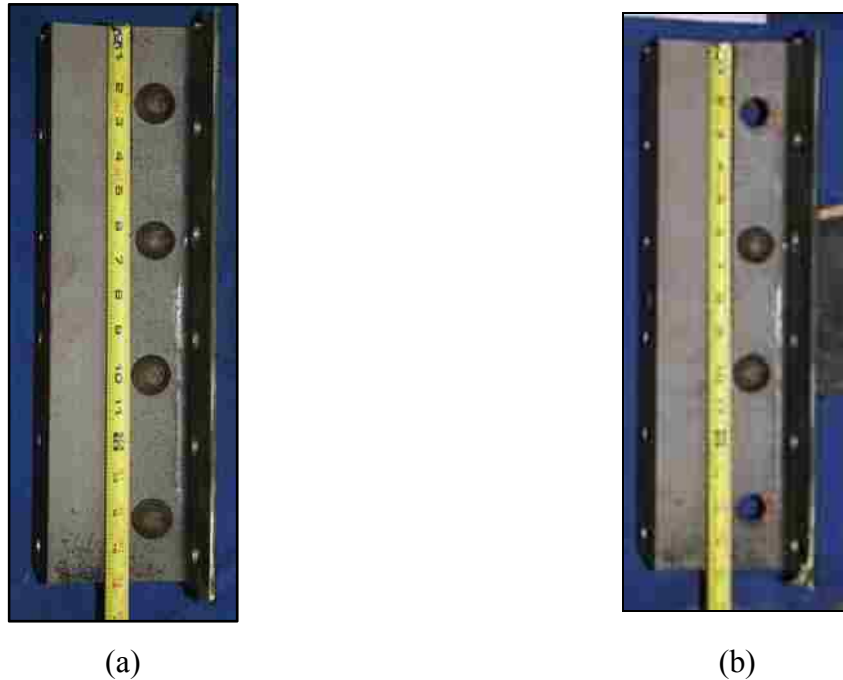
Removal of First and Last Rivet in West Guardrail (a) Prior to-rivet Removal (b) Post Rivet Removal - Specimen 2R (4L)
